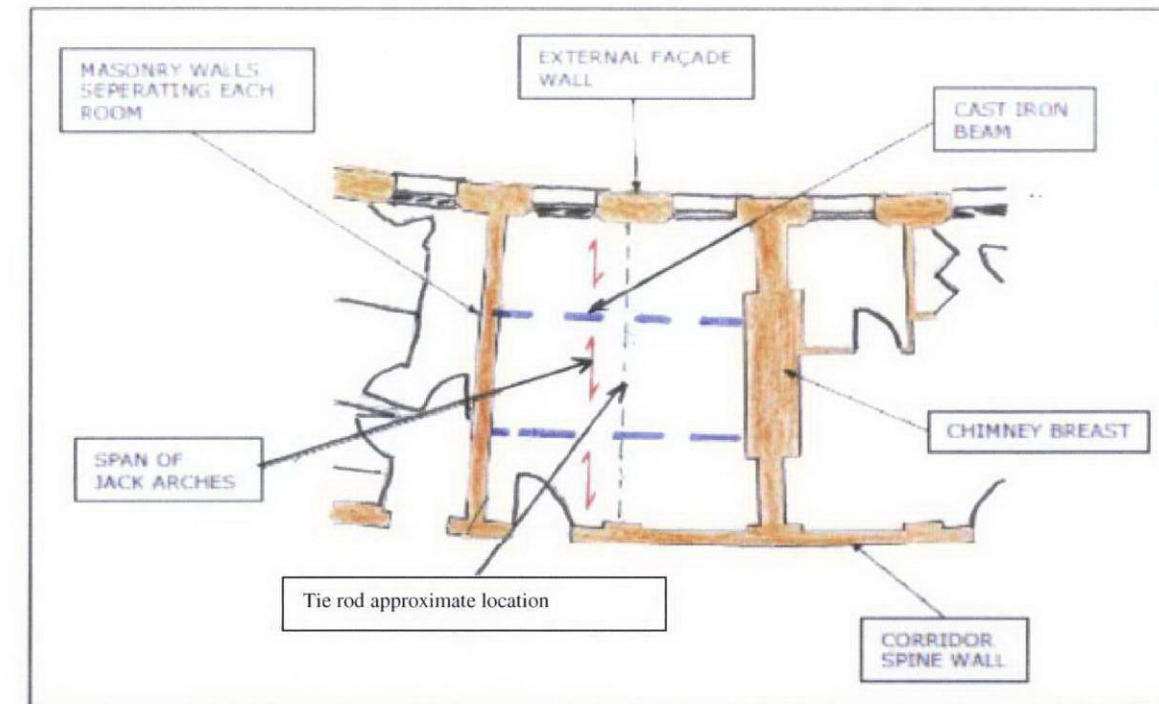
General structural layout of hotel indicating jack arch floor on level 2
